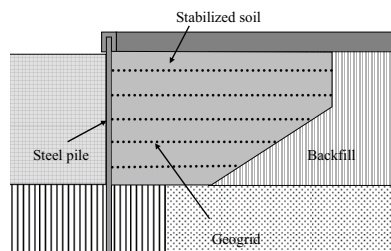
Geogrid reinforced quay wall with stabilized soft soil
